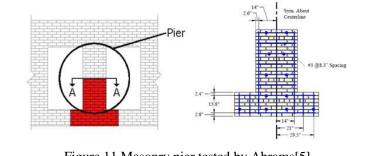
Masonry pier tested by Abrams[5] Pier F1 Pier F4
